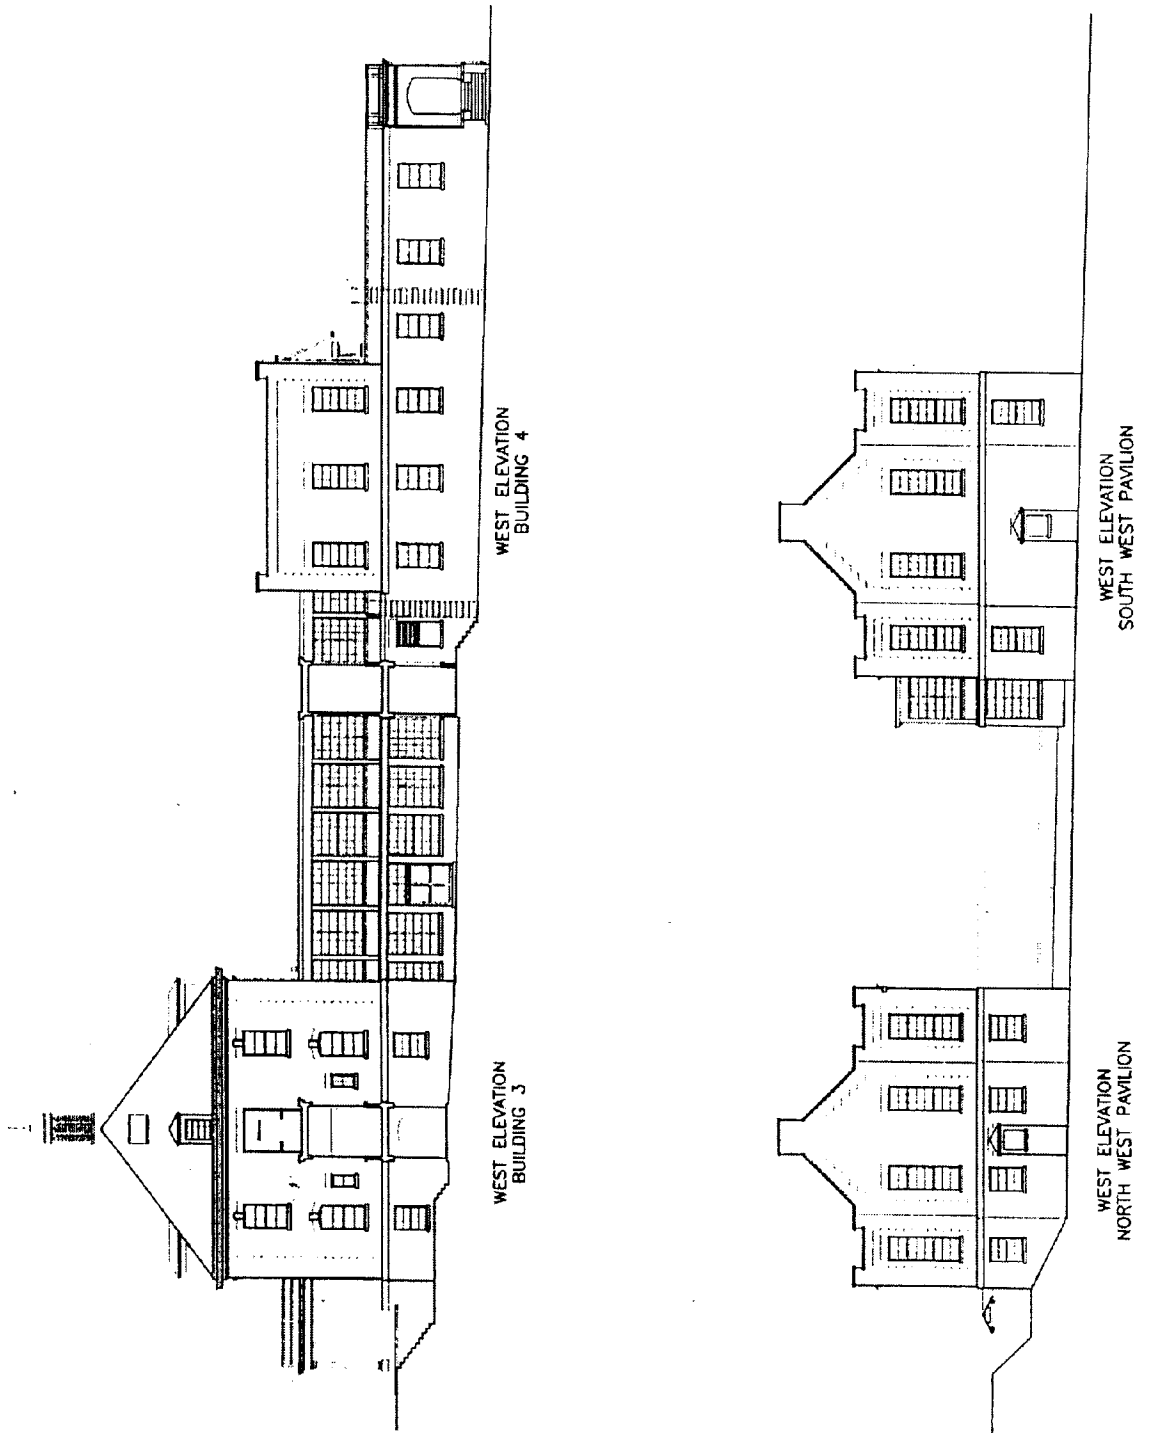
Figure D Building 3 and Building 4. West Elevations. These elevations represent the conditions of the building as they existed in 1994. They also show how the glazed solarium corridors connect Buildings 3 and 4 with each other and with the ward pavilions.
